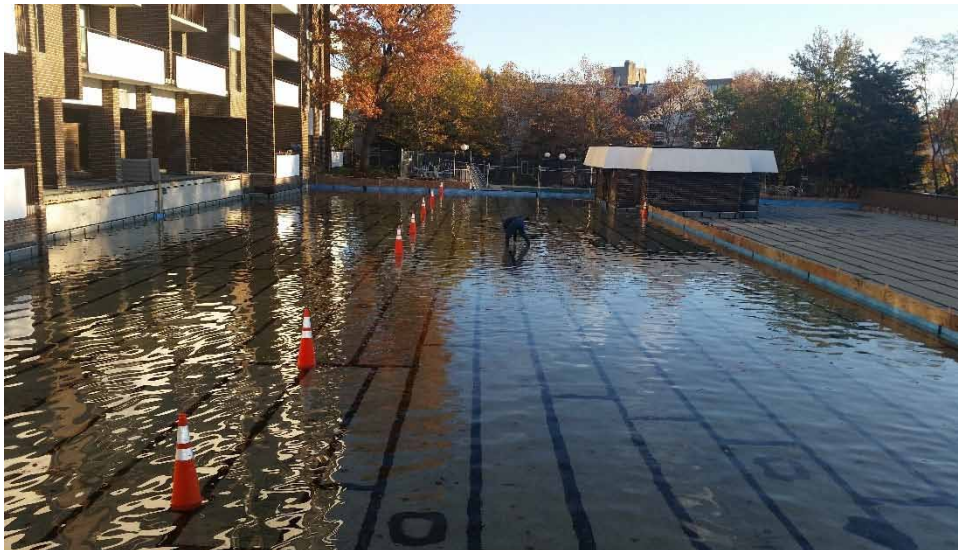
Up slope hydrostatic water test performed to validate the waterproofing system installation.
